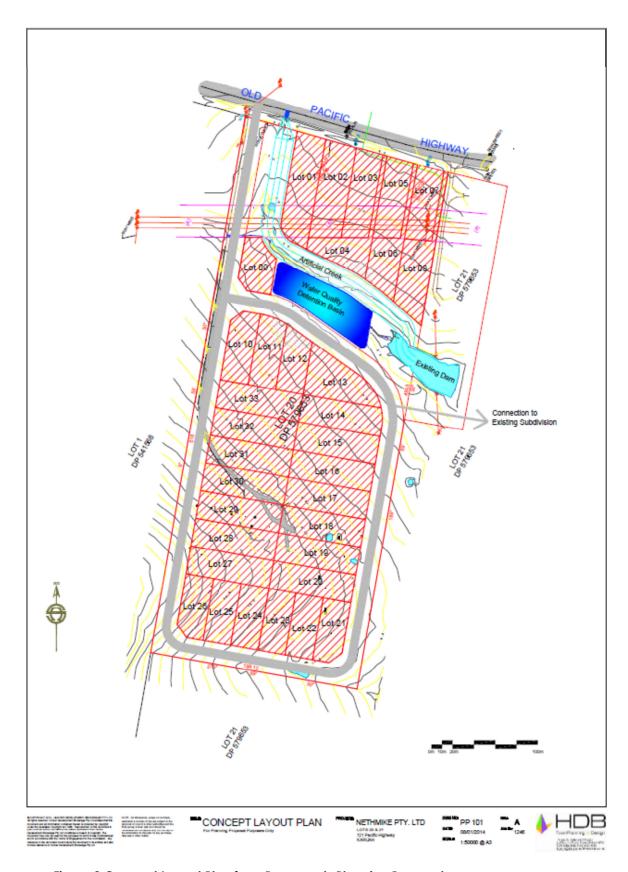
Concept Layout Plan from Proponents Planning Proposal
